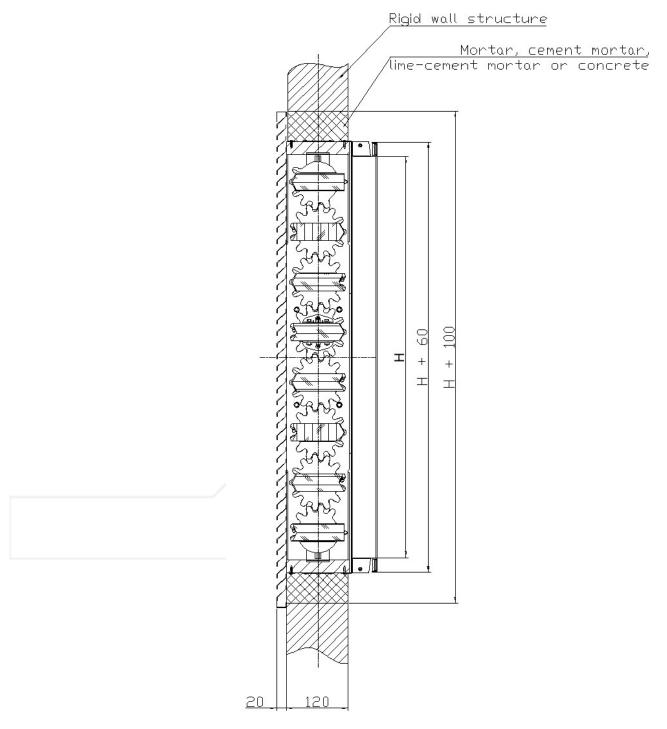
Installing method of WKP-O fire dampers in rigid wall with KST grille in rigid wall structure.
